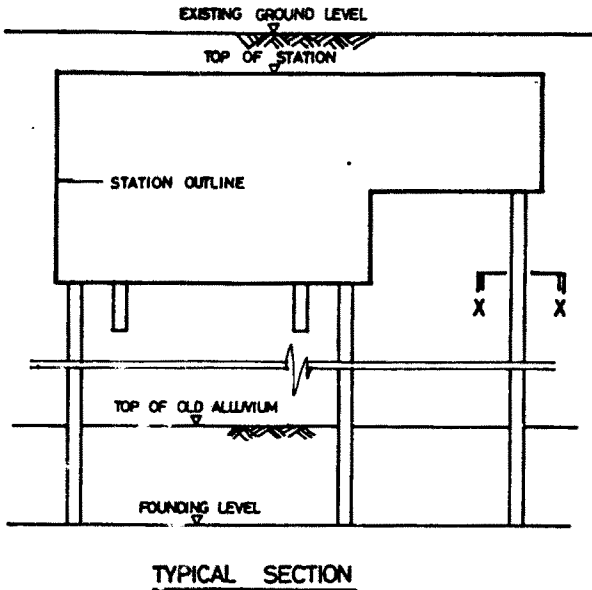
CONTRACT 310 - TYPICAL CROSS SECTION
